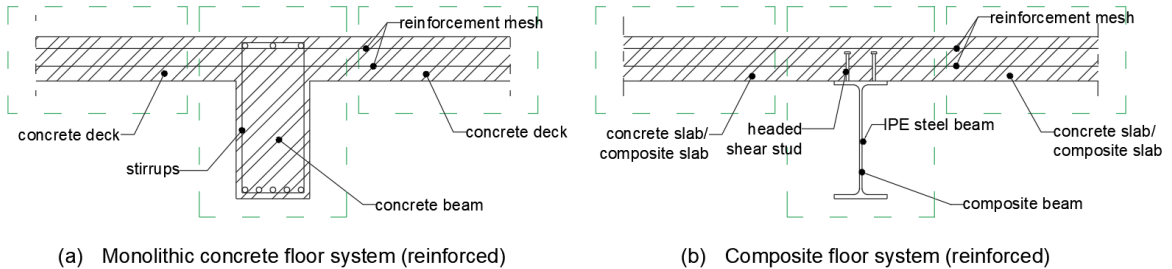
Two types of cast in situ floor systems often used in buildings
